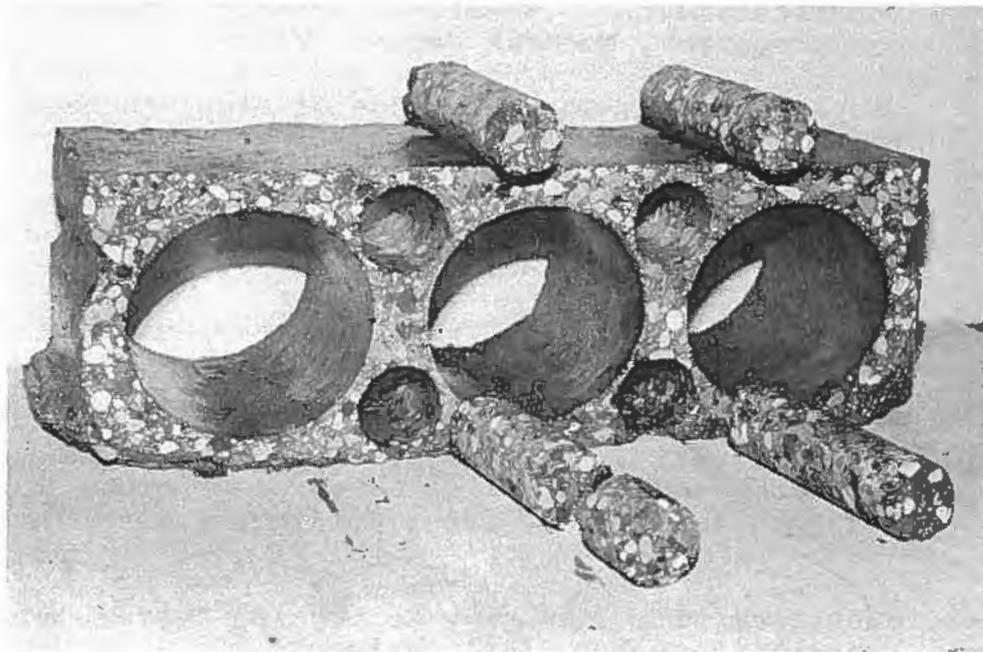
The cross-section of a hollow-core slab with drilled cores, manufactured in laboratory.
